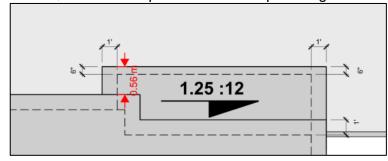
The highlighted eave from Figure I, as seen from the top-down in the roof plan.
